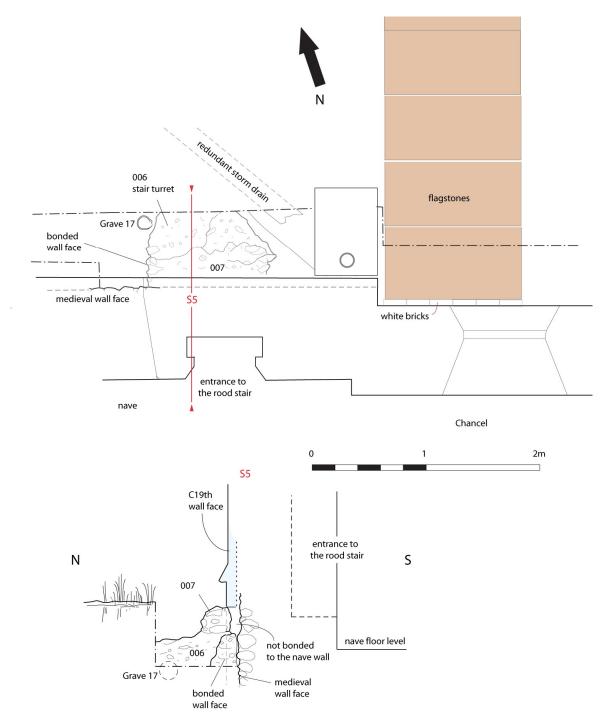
Plan and section of French drain trench showing the remains of the stair turret and Grave 17 (see church plan Fig. 2 for location).
